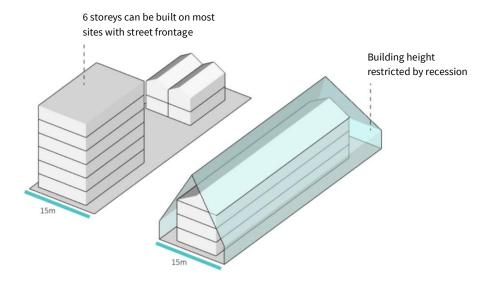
[left] Perimeter block building which strengthens the street edge and provides a suitable gap between building forms for sunlight and trees. [right] a recession plane building which results in a long building form which faces the side boundary (can cause privacy issues) and does not include a break for tree canopy or visual mitigation of the long form.
